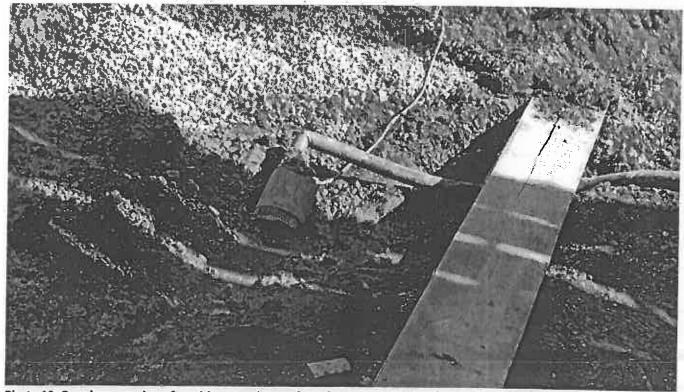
Ongoing pumping of muddy groundwater from foundation footing into active stormdrain onsite.
